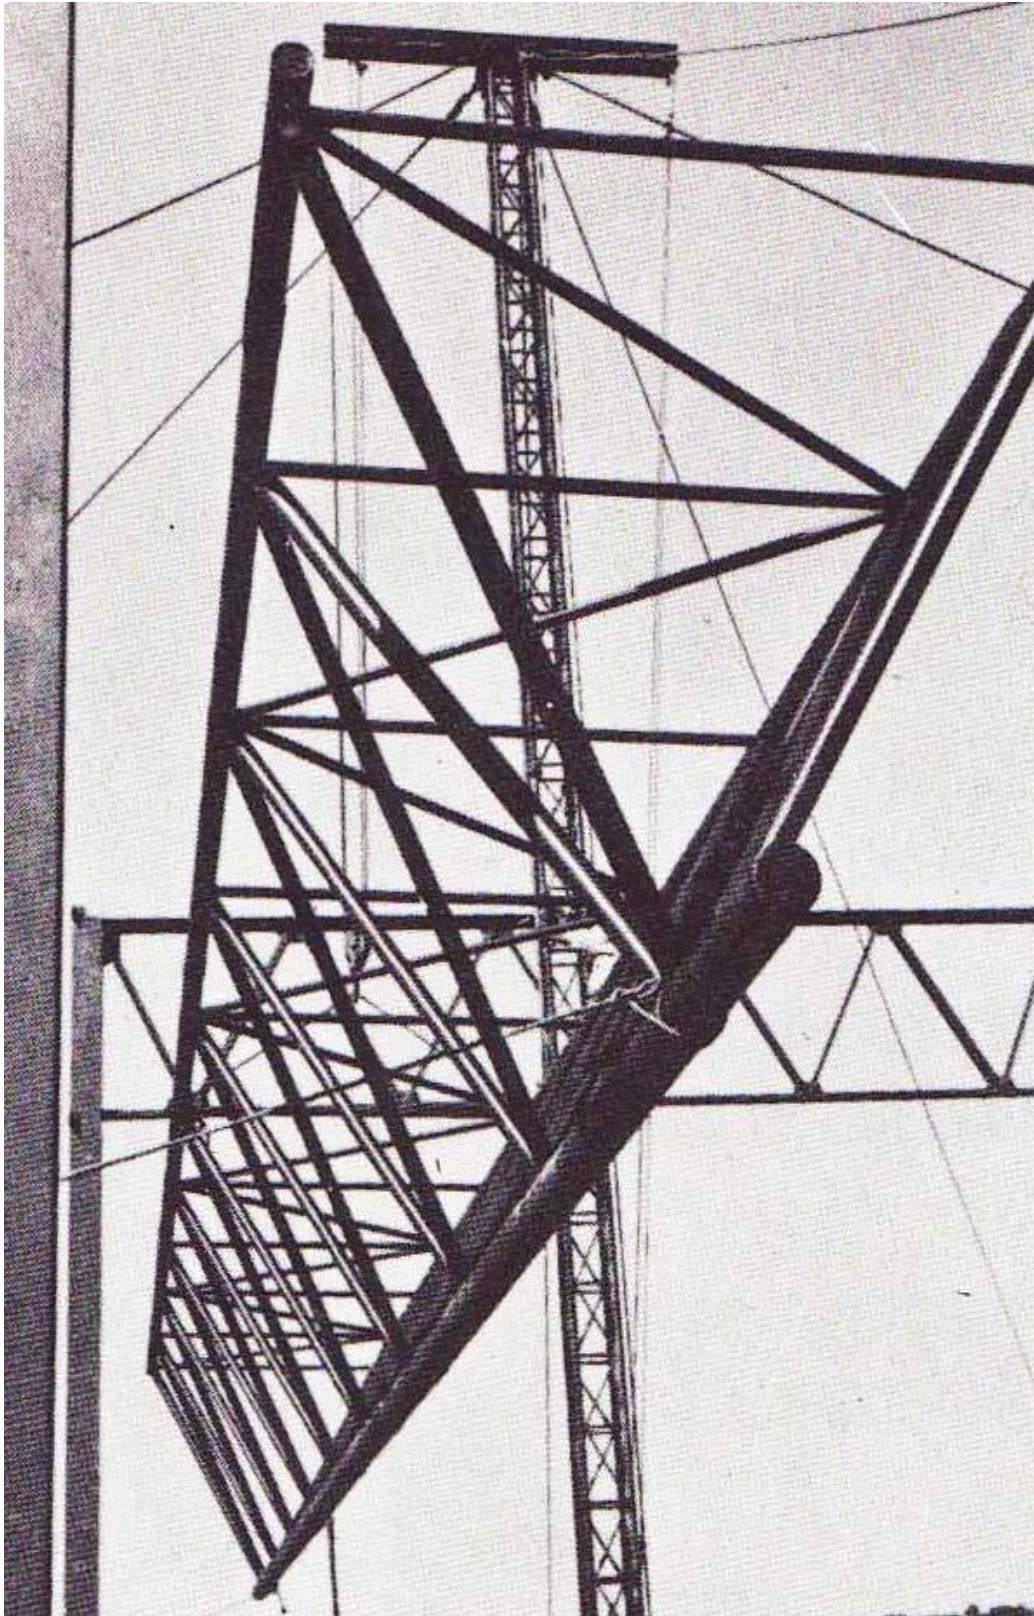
Renault Car Manufacturing Plant, lifting up space frames.
